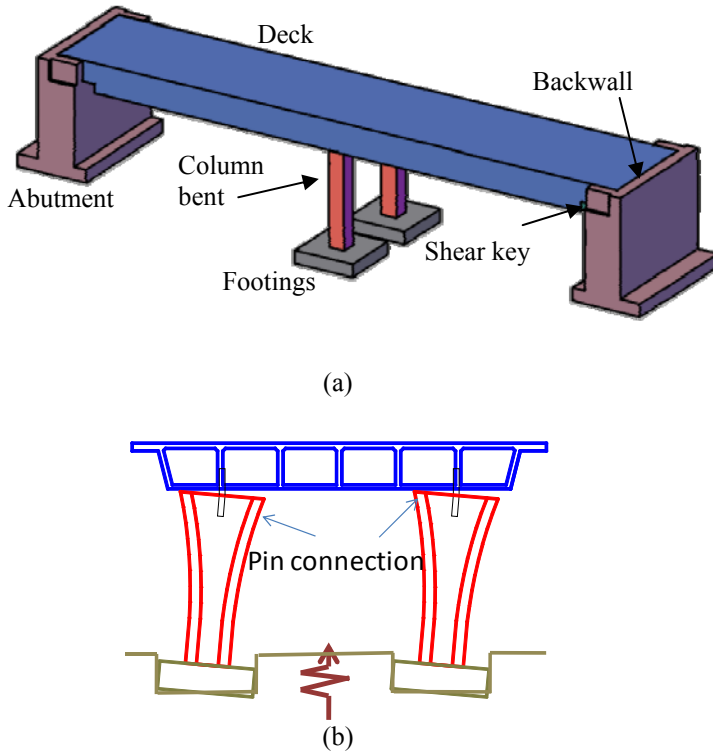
Schematic of ordinary bridge system and detail showing a hypothetical in connection between the bridge deck and columns (a) 3-D view (b) vertical view.
